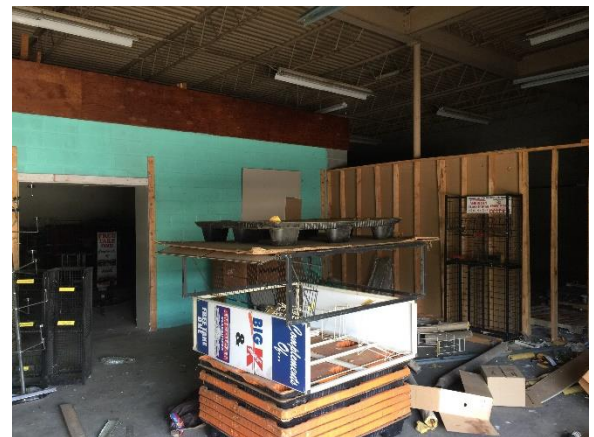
Example view of vendor area, Warehouse #3 (Building 3).
